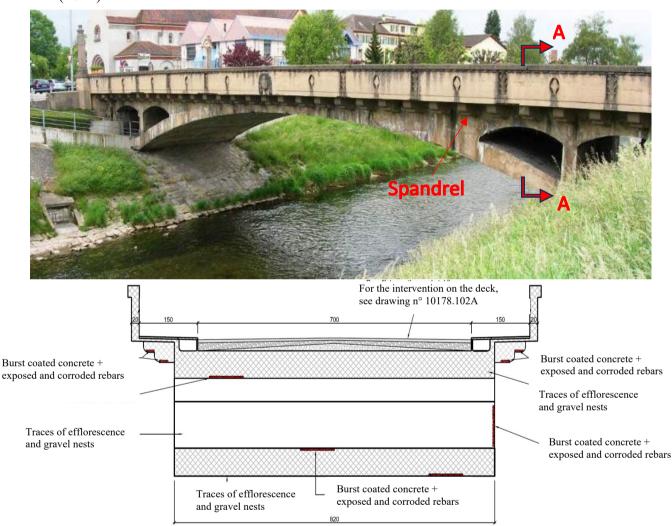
Guillermaux bridge and cross-section A-A [unit cm] indicating its existing condition
